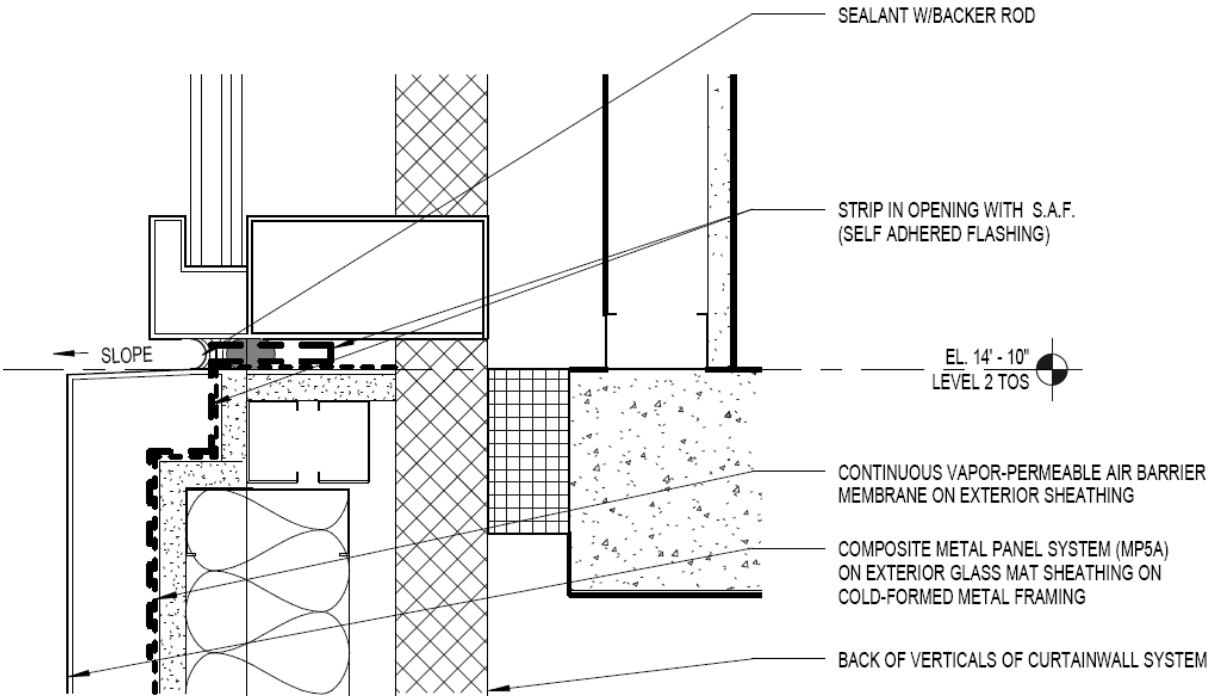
Detail Section of Sill @ Second Floor - Detail 3 on Drawing A550
